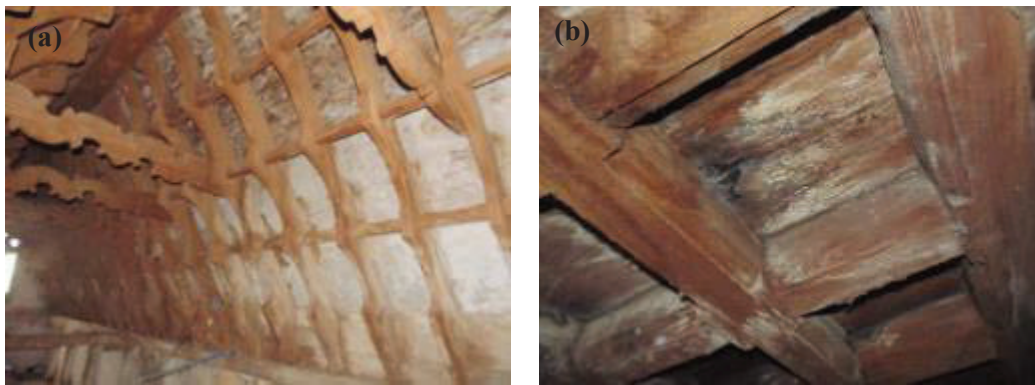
(a) Loss of plaster and mortar in the ceiling and walls at the seventh-floor level, and (b) deterioration in lower ceilings
